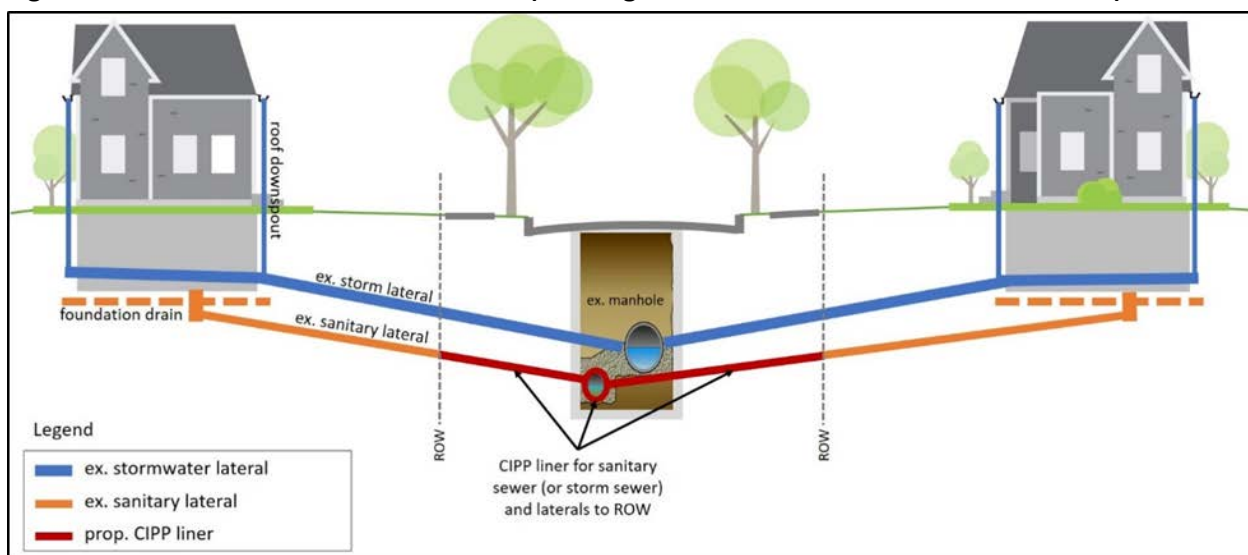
Stormwater Separation Concept for Common Trench Areas
